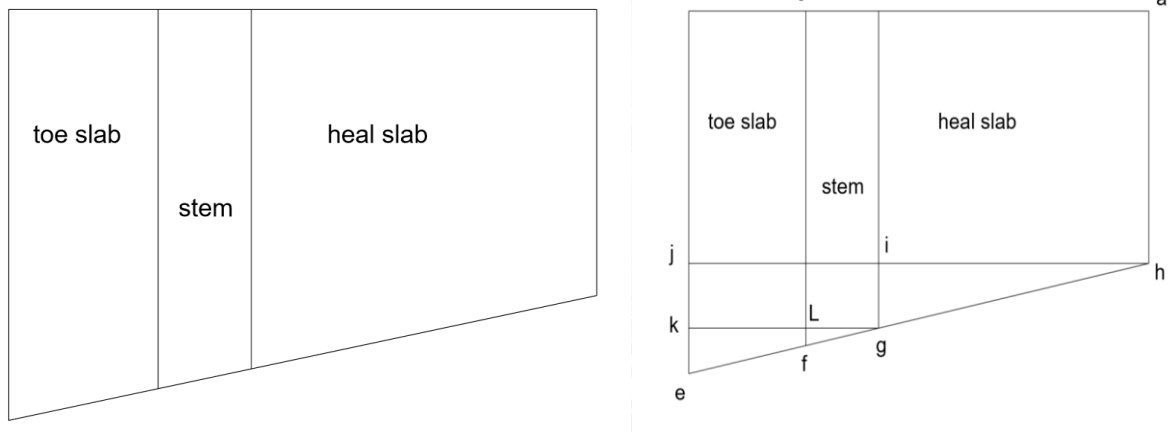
Cantilever retaining wall (Stability calculation Top view)
